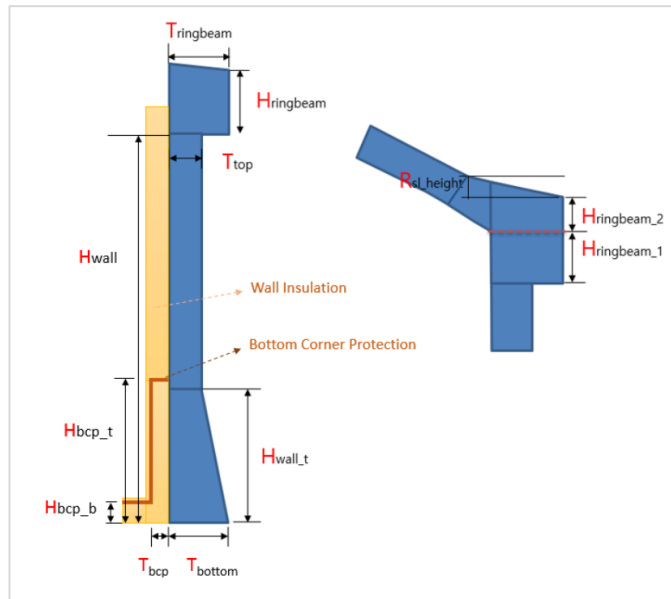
Tank Definition Dialog (Structure Definition/ Concrete Tank/ Wall and Ring Beam)
